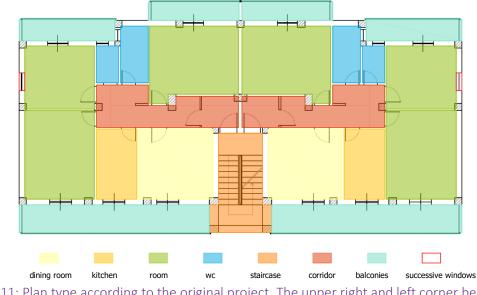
Plan type according to the original project. The upper right and left corner bedrooms have windows on the short fronts of the pilot.
